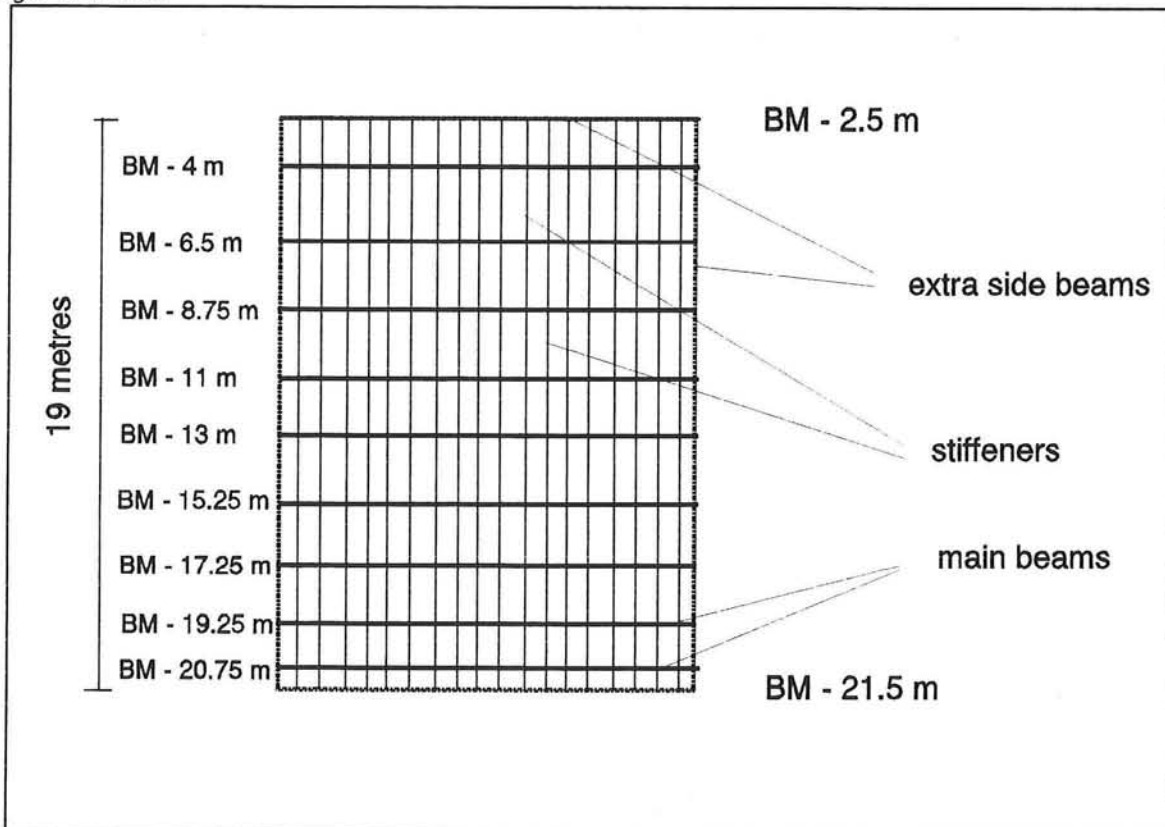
Structure scheme of the entrance gate with main beams and stiffeners
